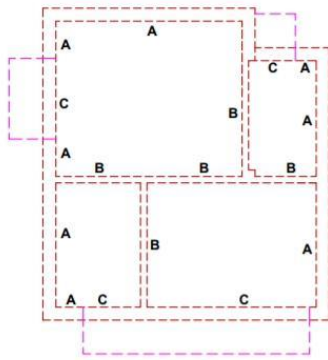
DETAILING OF BARS (TYPICAL) FOR TWO WAY SLAB
